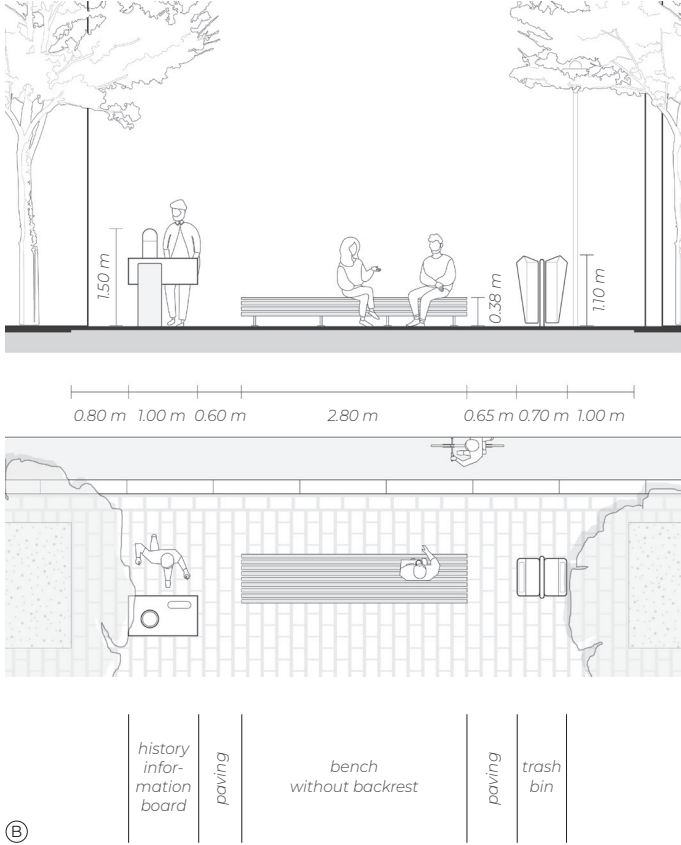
A road cross-section of the road B in current situation, which shows the fully paved walking path guiding to the port area. A detail section shows the configuration of a bench, a trash bin and a history information board.
